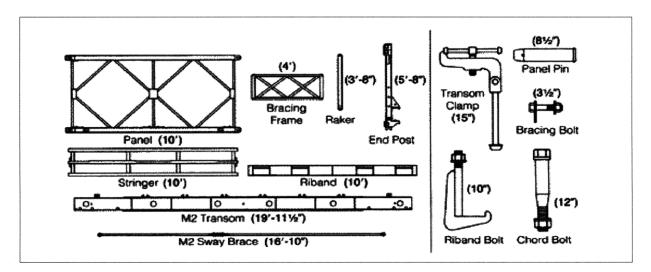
DONALD BAILEY'S SYSTEM, 1944 [WWW.FHWA.DOT.GOV]
